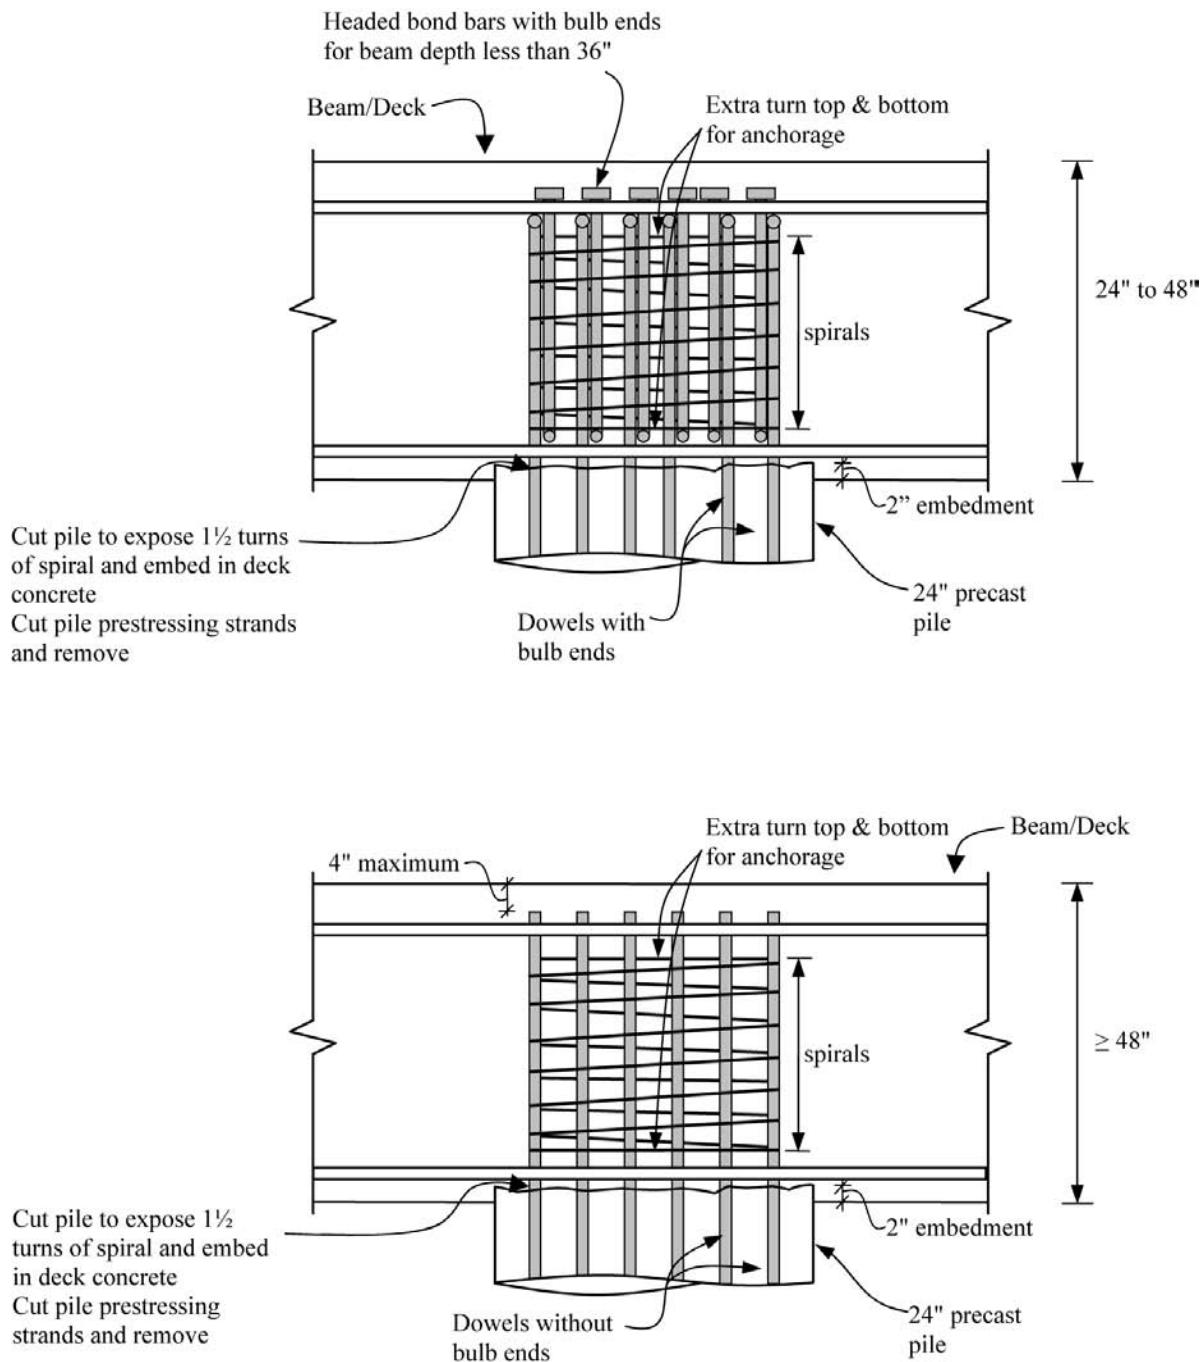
Port of Long Beach (2009) wharf design criteria pile-deck connection details.
